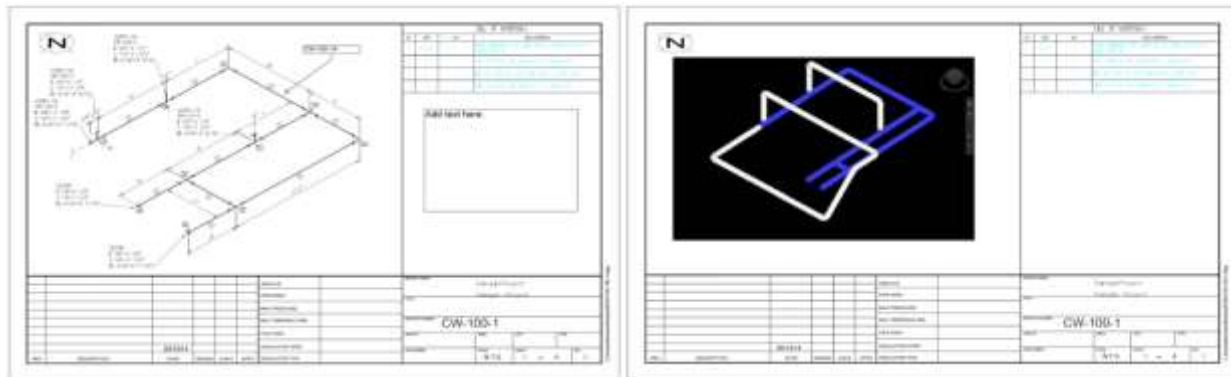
Two-Sided Isometric Drawing – Spool 2
